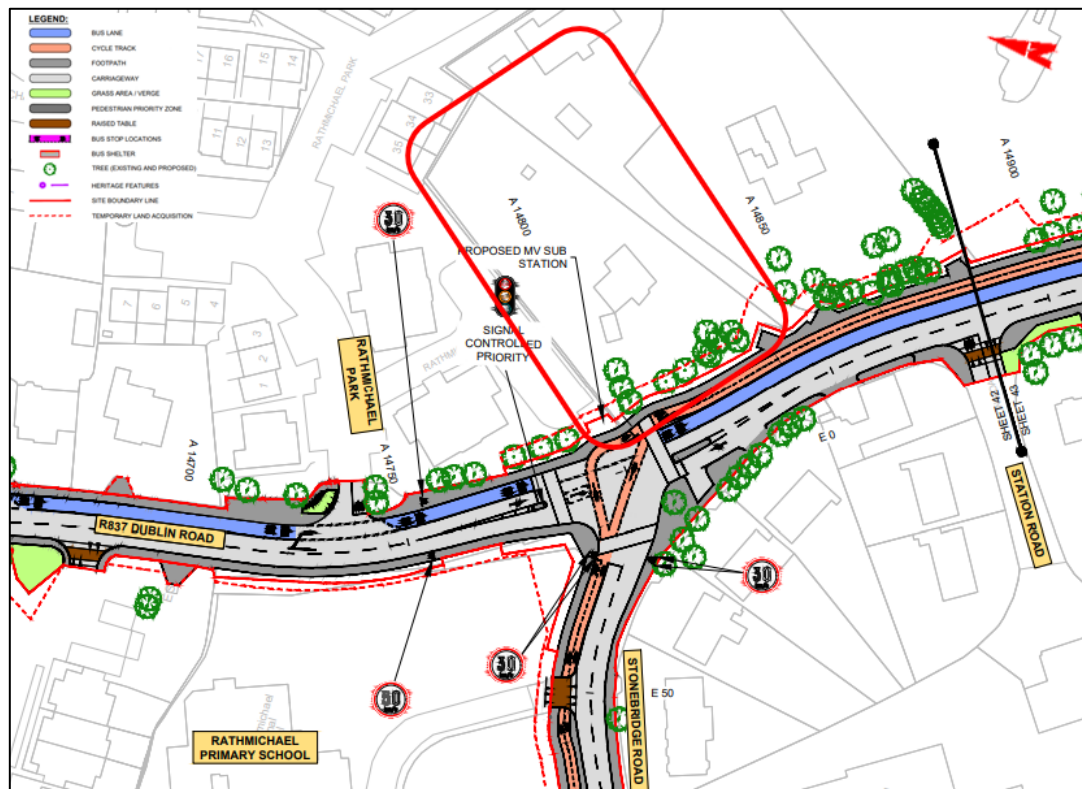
Extract from General Arrangement Drawing on Dublin Road (Sheet 42)
